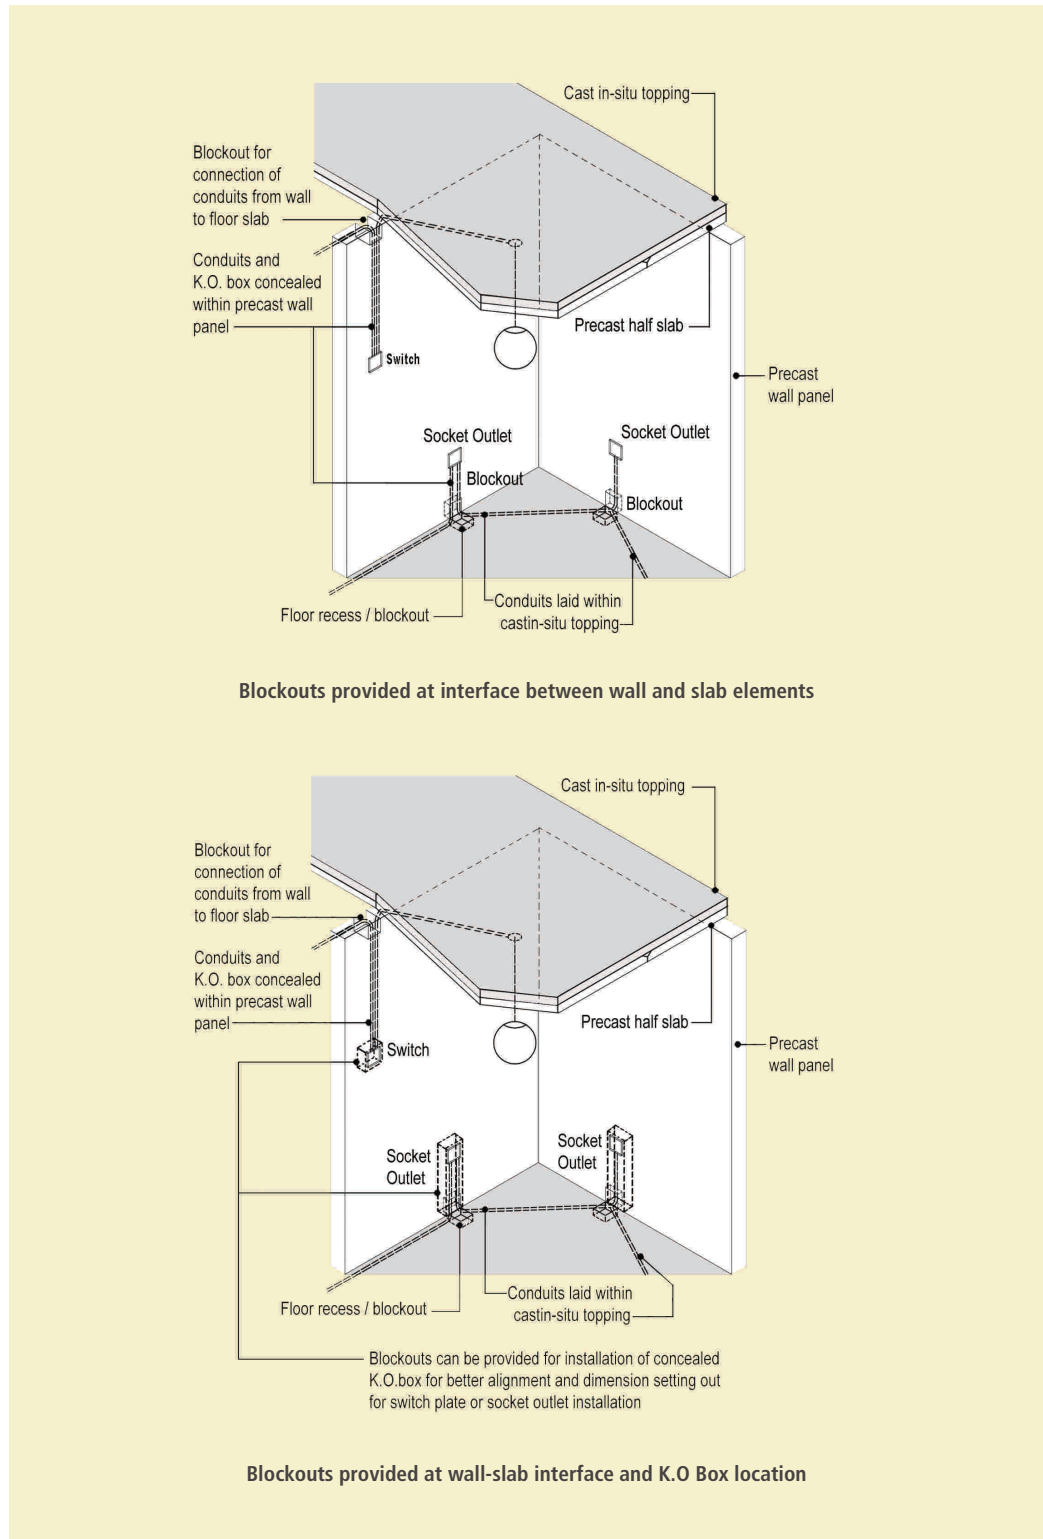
Connection of conduits between precast wall panels and slab using the first approach
